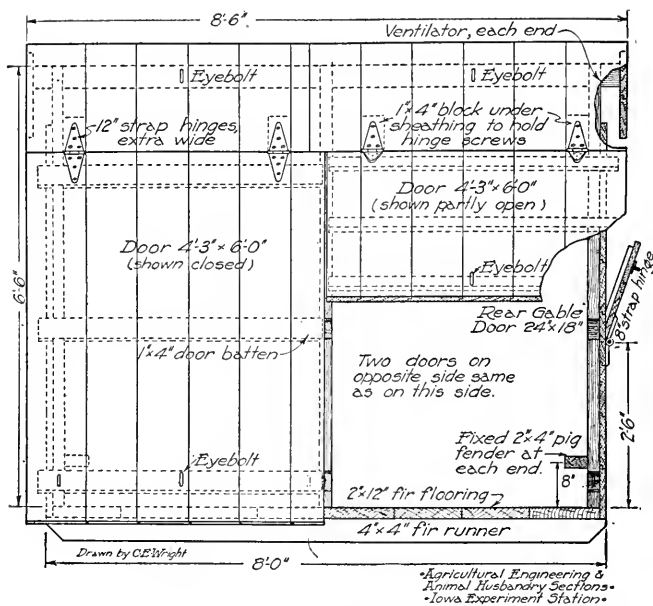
"A" House (Doors Hinged at Top). Side elevation.
